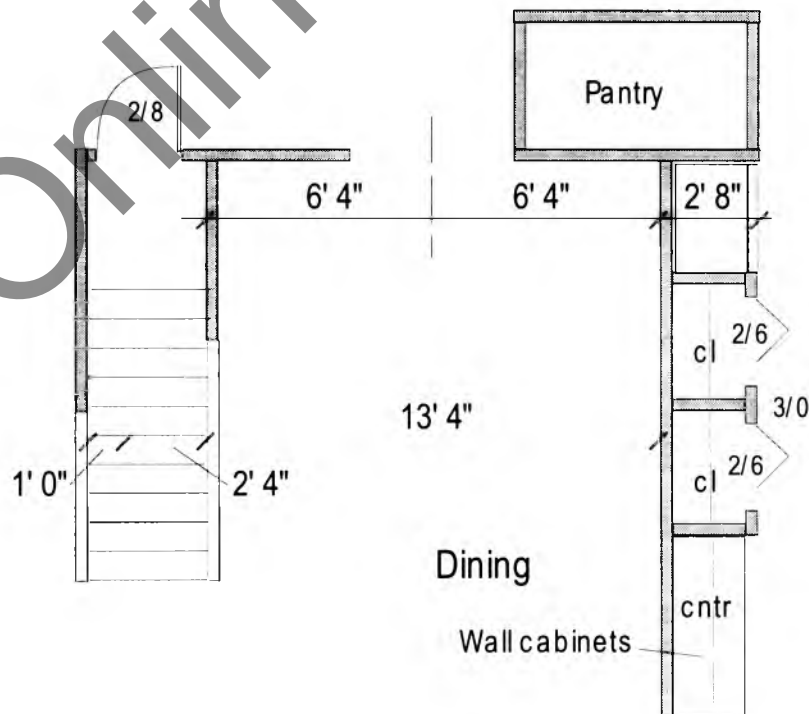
Enlarged drawing of the dining area in Figure 1-4.
